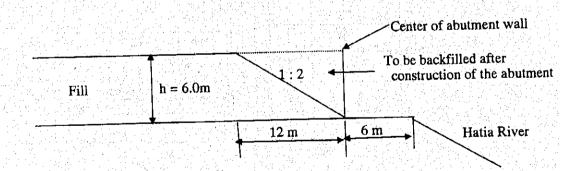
Longitudinal Section of Fill before Pilling for Hatia Bridge West Approach
